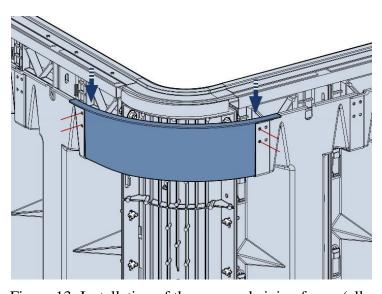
Installation of the corner chaining forms (all pools except ovoids)
